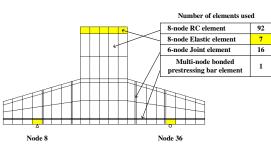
Finite element mesh for precast concrete pier cap specimen
